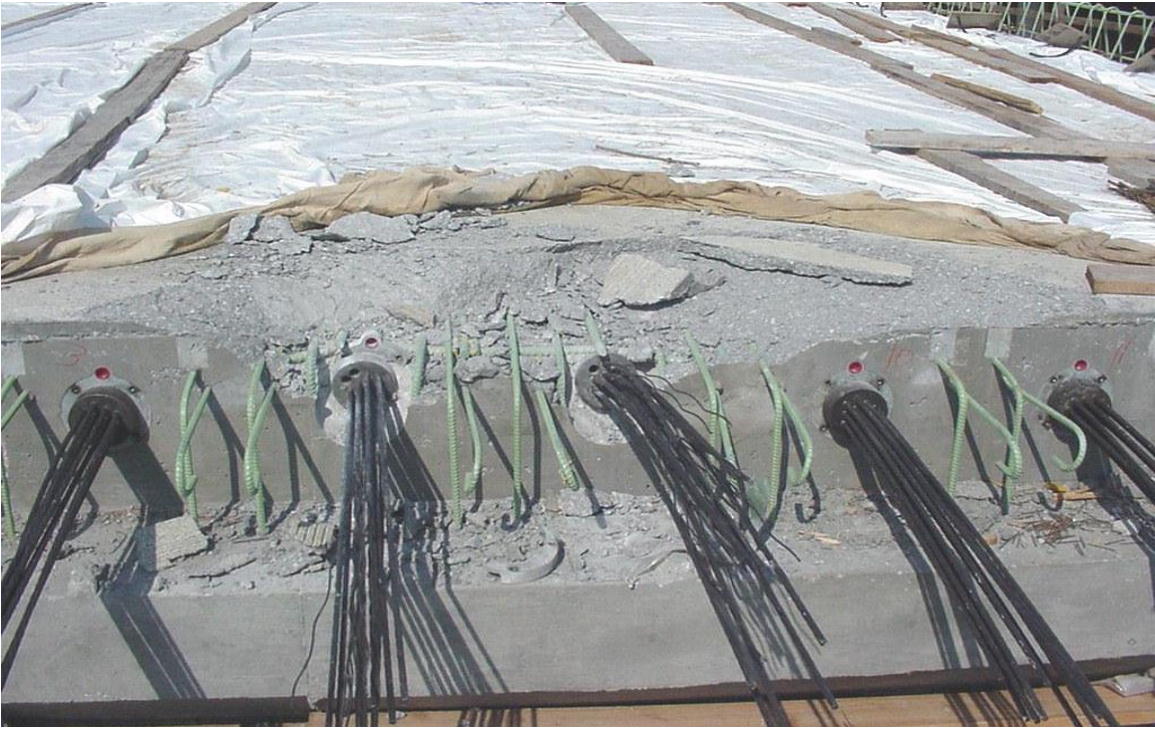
Failure of longitudinal anchorage points due to poor concrete consolidation (KDOT).
